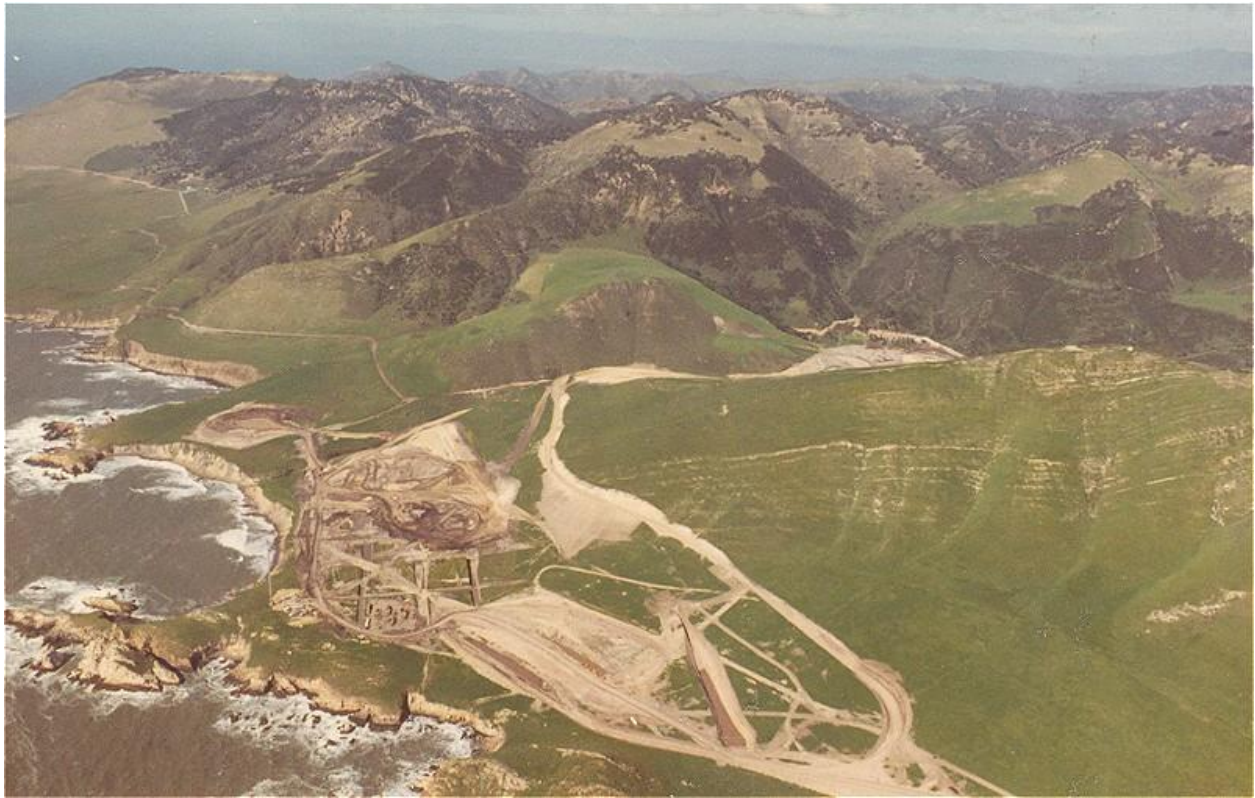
Aerial photograph showing site excavation work to create the flat terrace just above sea level and the leveled plateau (upper terrace) in the hillside above to construct the Diablo Canyon Power Plant in March 1969.
